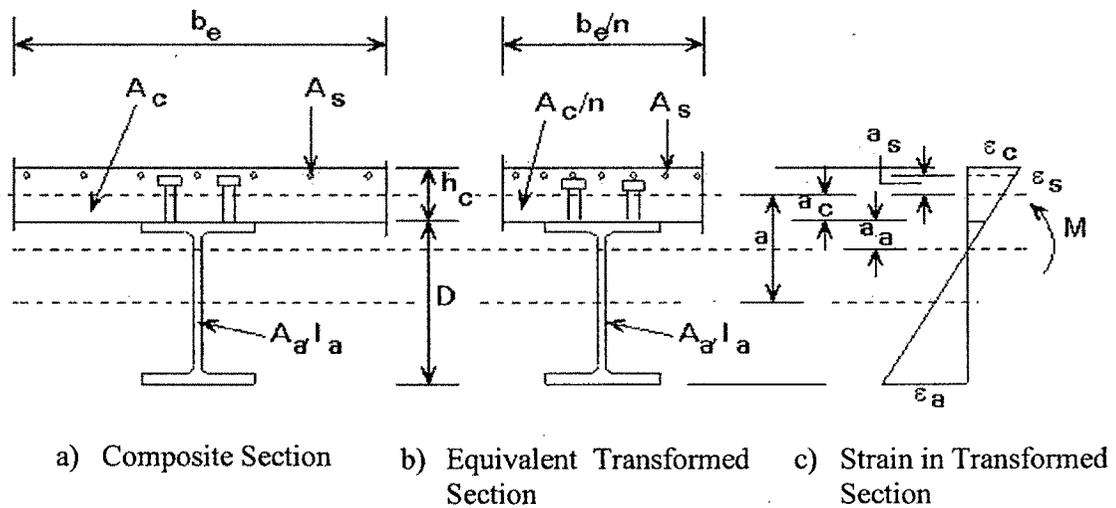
Composite Steel-Concrete Section and Equivalent Transformed Section
